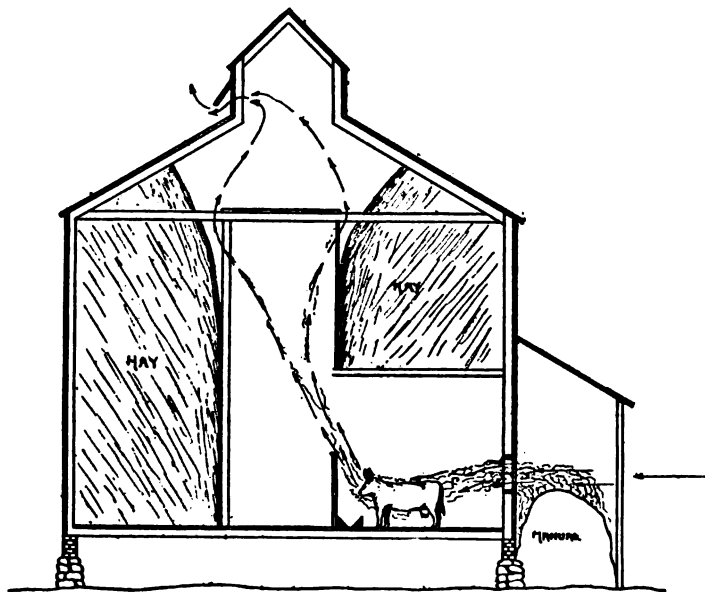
Section of stable, in which wall scuttles are used as inlet openings for the admission of air.
